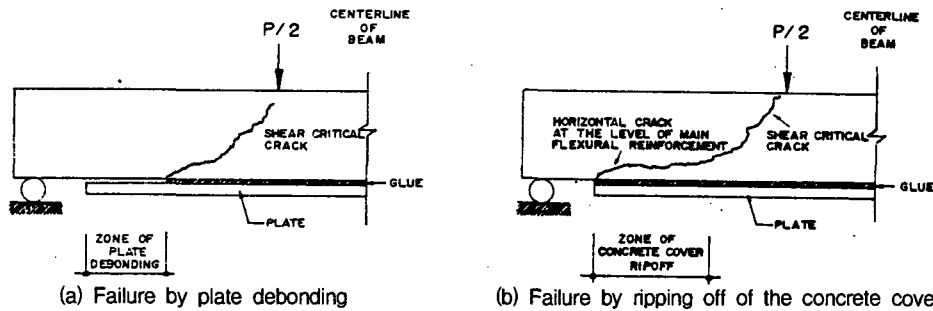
Sudden Shear Failures of Plated Beams[6]
